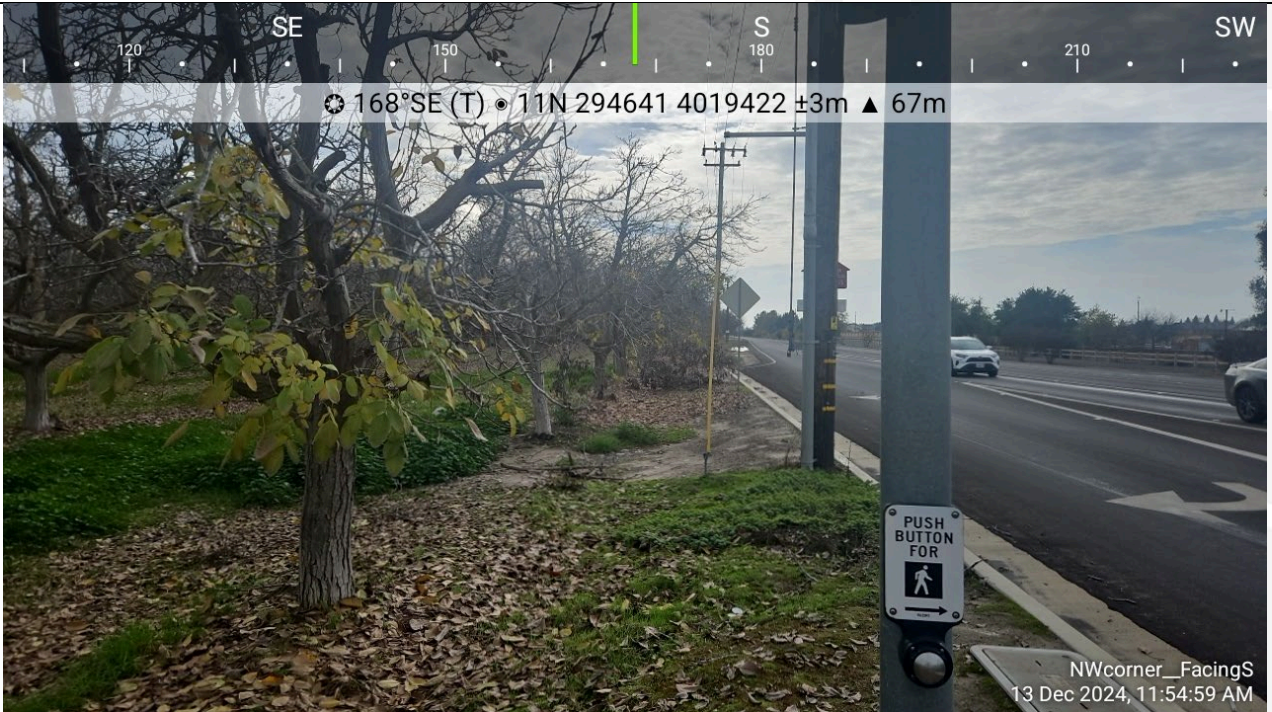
View of site conditions on the northwest corner of the project area facing south.
